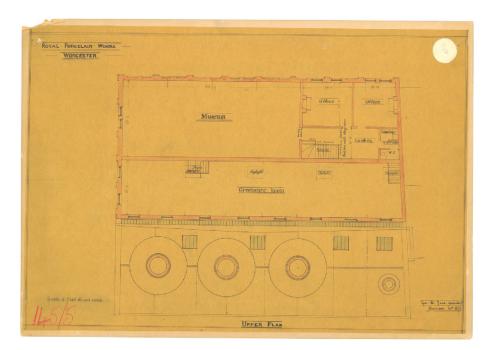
First floor of Buildings K2 and K3 October 1878 (source: Worcester Porcelain Museum)
